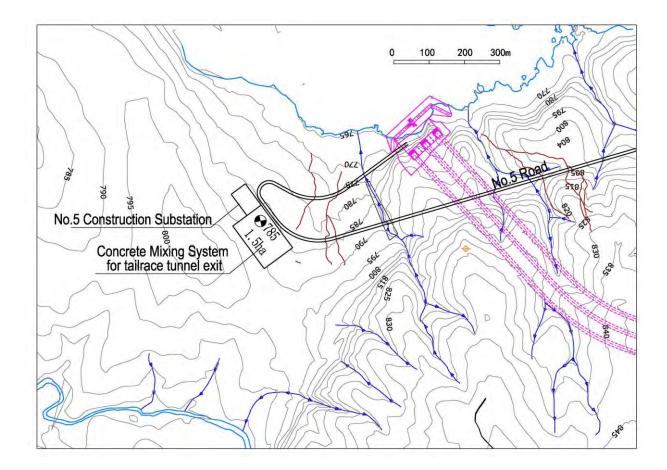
Construction Tailrace Outfall Construction Area Layout Plan
